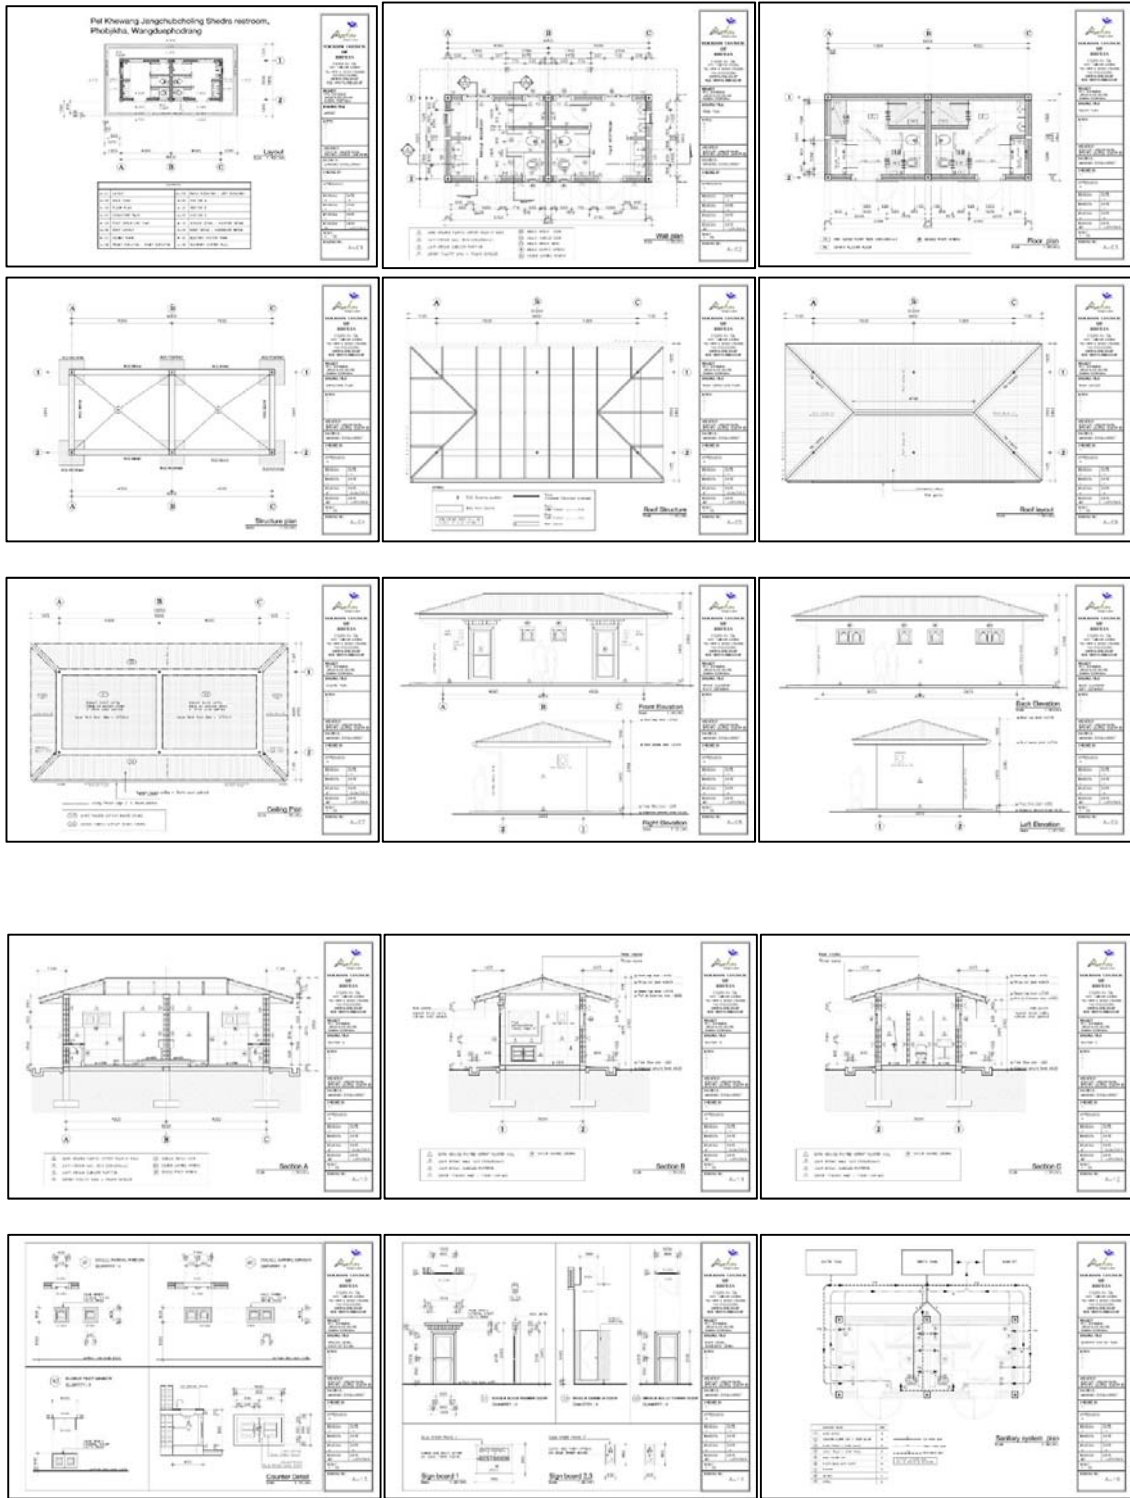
Construction drawings of Pel Khewang Jangchopcholing Shedra restrooms.
